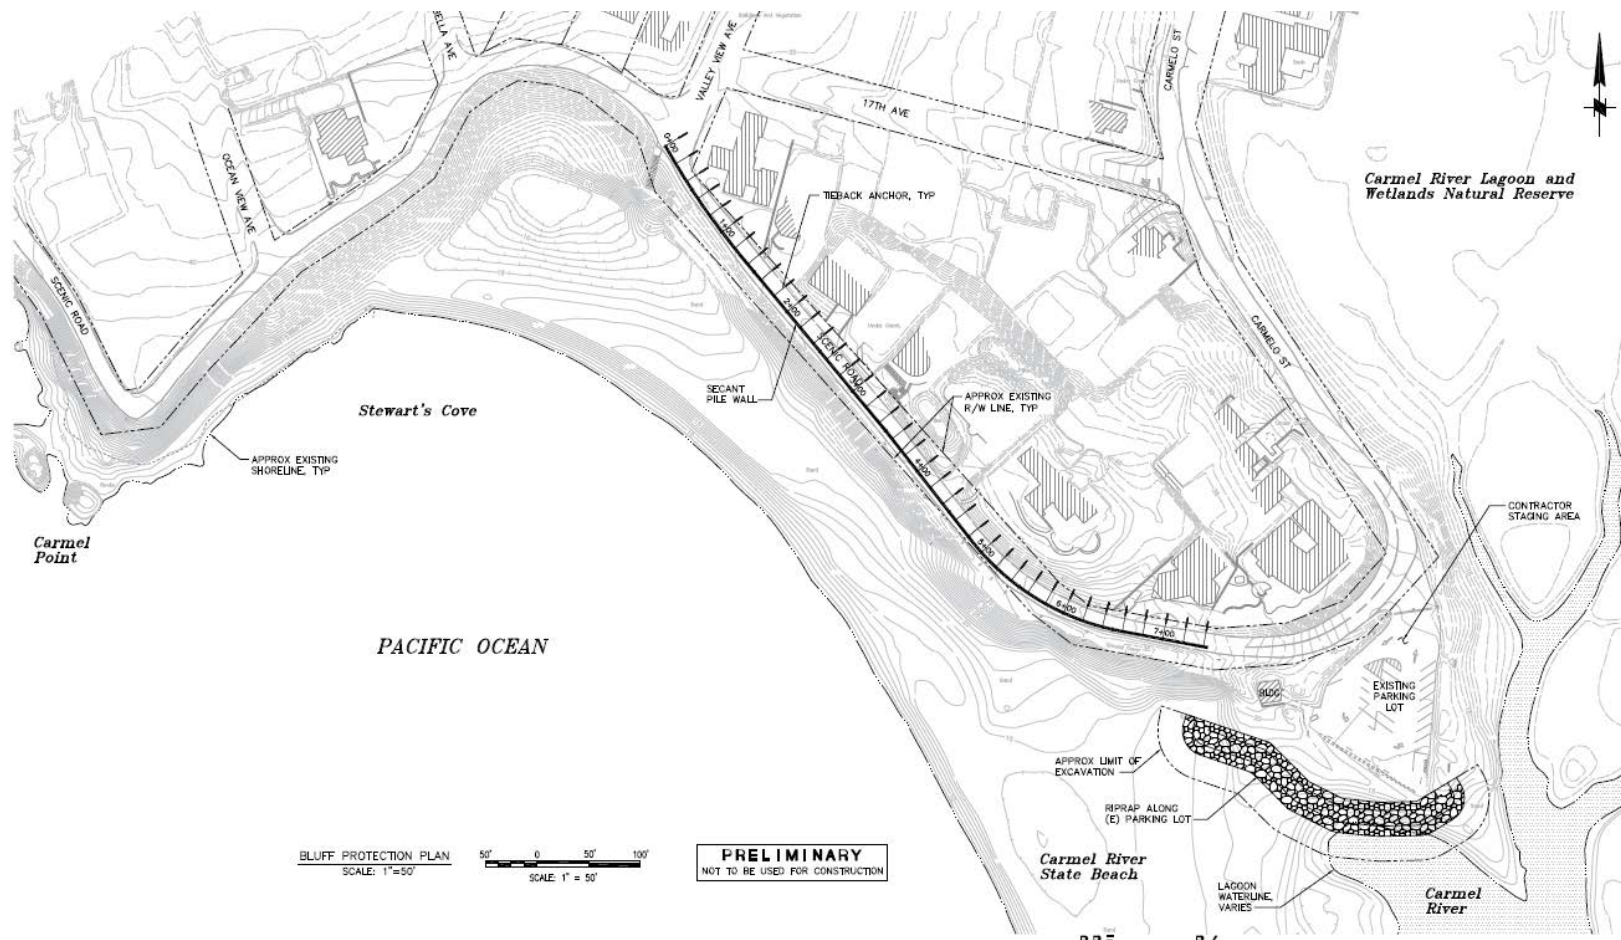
The proposed alignment of the full height wall alternative for Scenic Road protection. The rock slope protection element shown surrounding the existing parking lot is optional and dependent on approval from State Parks. The maps depicts the Carmel River against the parking lot and proposed RSP – this is not the current configuration of the river/lagoon which during the dry season is much farther south – see current Google Earth imagery.
